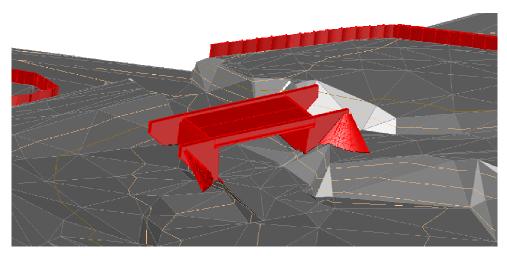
The simulation of the bridge construction on site (ground level surface and the bridge subsystem).
